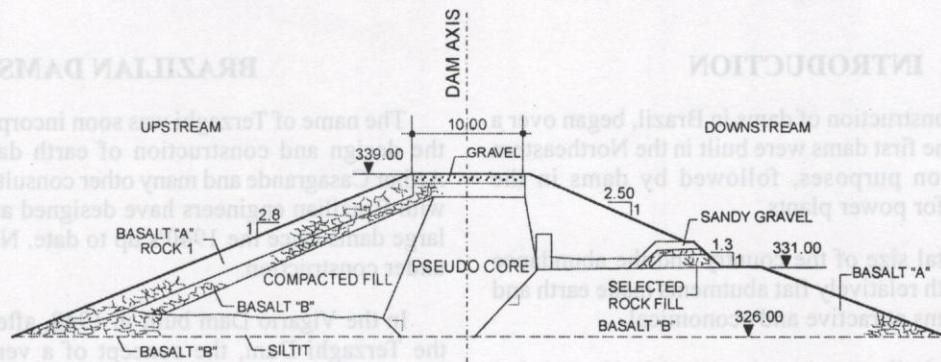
The right embankment of Capivara Earth Dam (Cadastro Geotécnic 1983)
